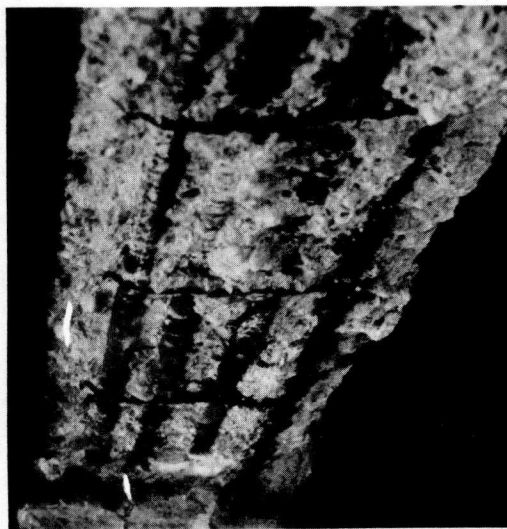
Area where deterioration has advanced to such degree as to spall off a considerable portion of the beam bottom.
